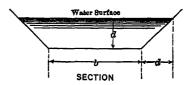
(Part 3 of 3).—Hydraulic Elements of Trapezoidal Sections.
